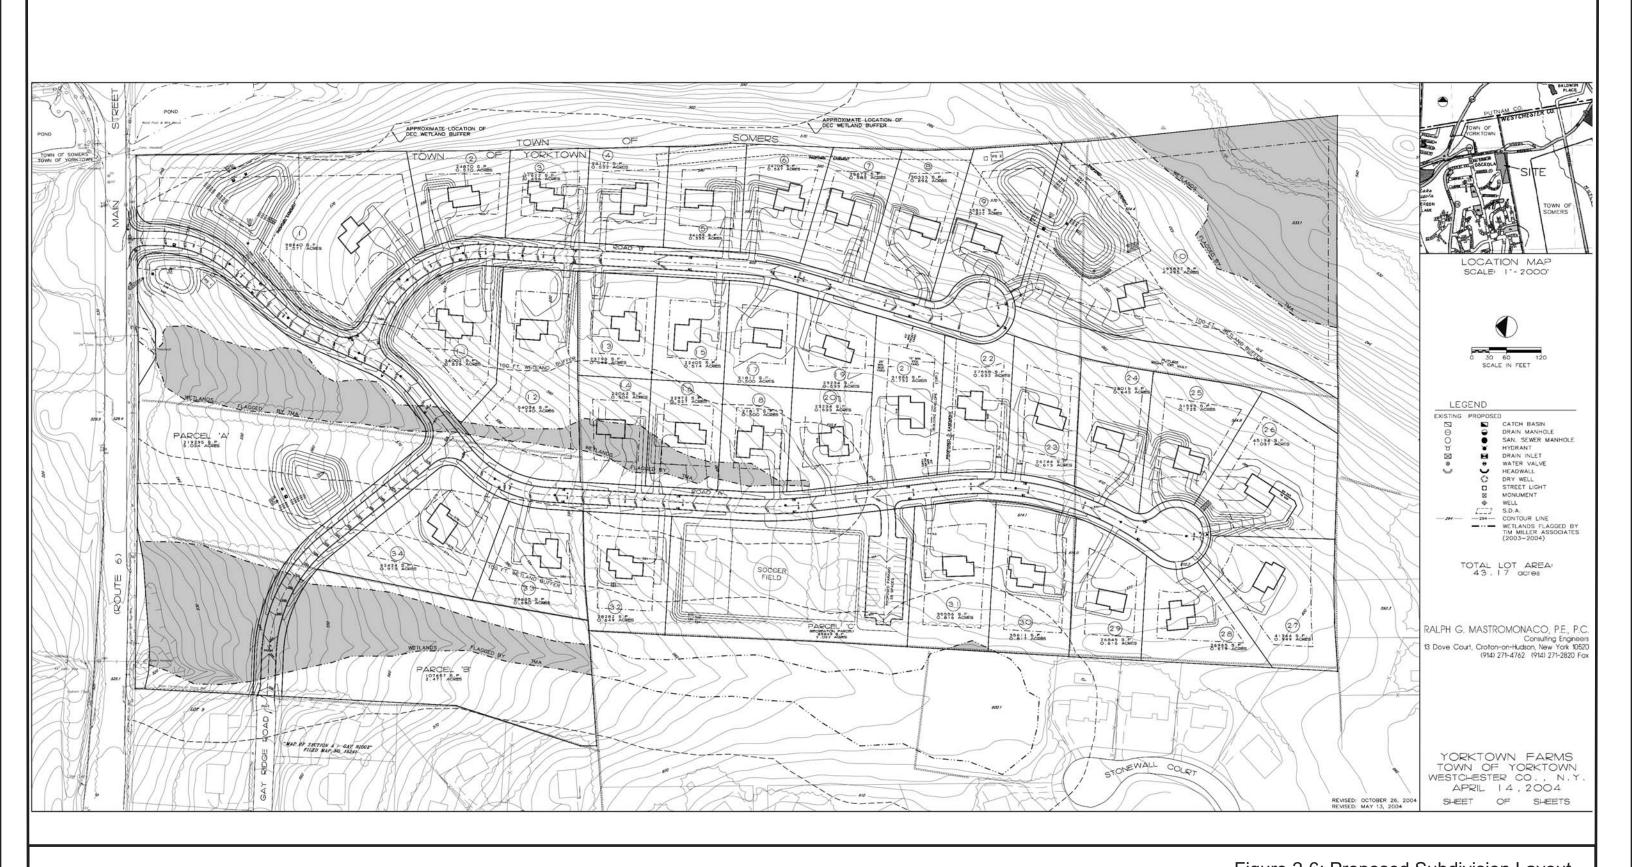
Proposed Subdivision Layout Yorktown Farms Subdivision Town of Yorktown, Westchester County, New York Source: Ralph G. Mastromonaco, P.E., P.C., rev. 10/26/04 Scale: As shown
